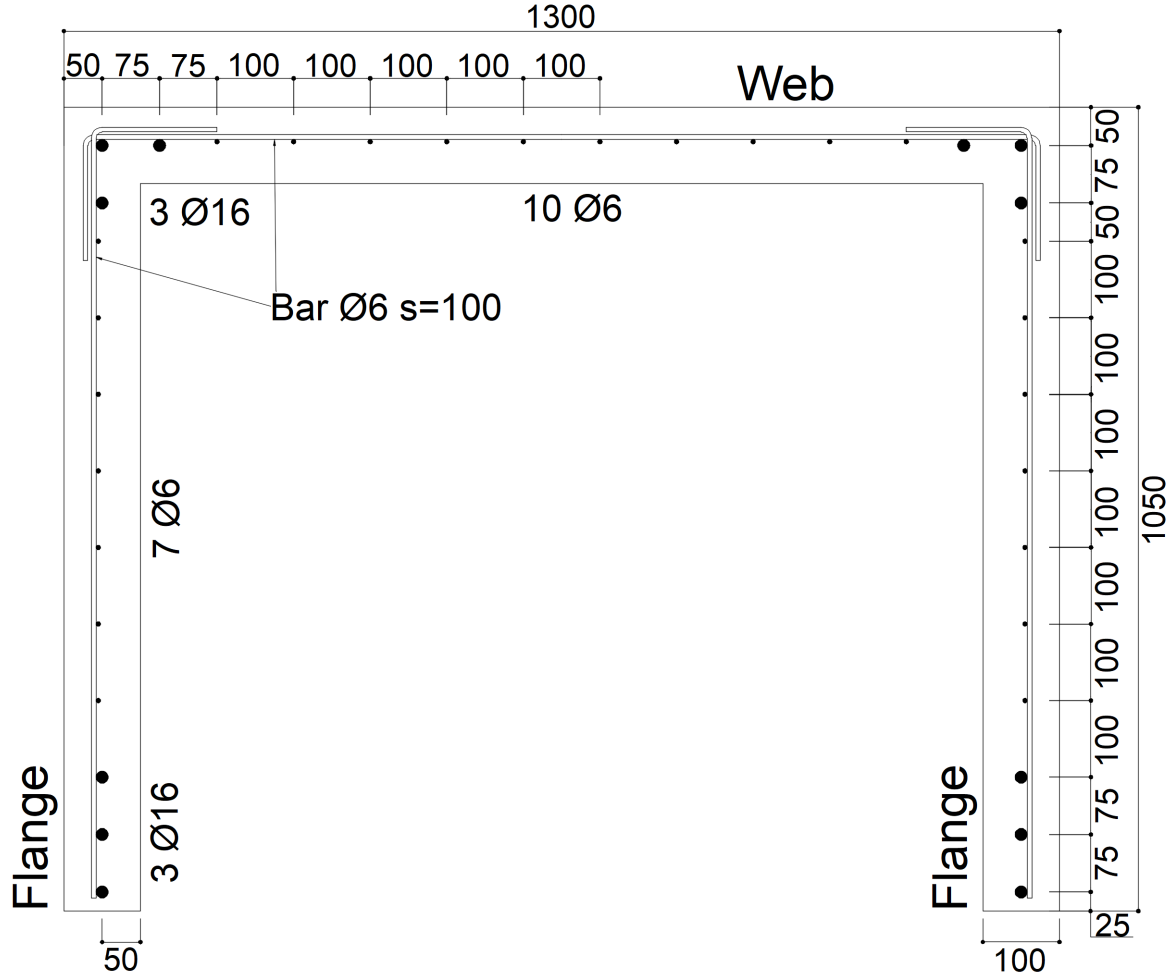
TUF: Cross section and reinforcement detailing [Unit: mm].
